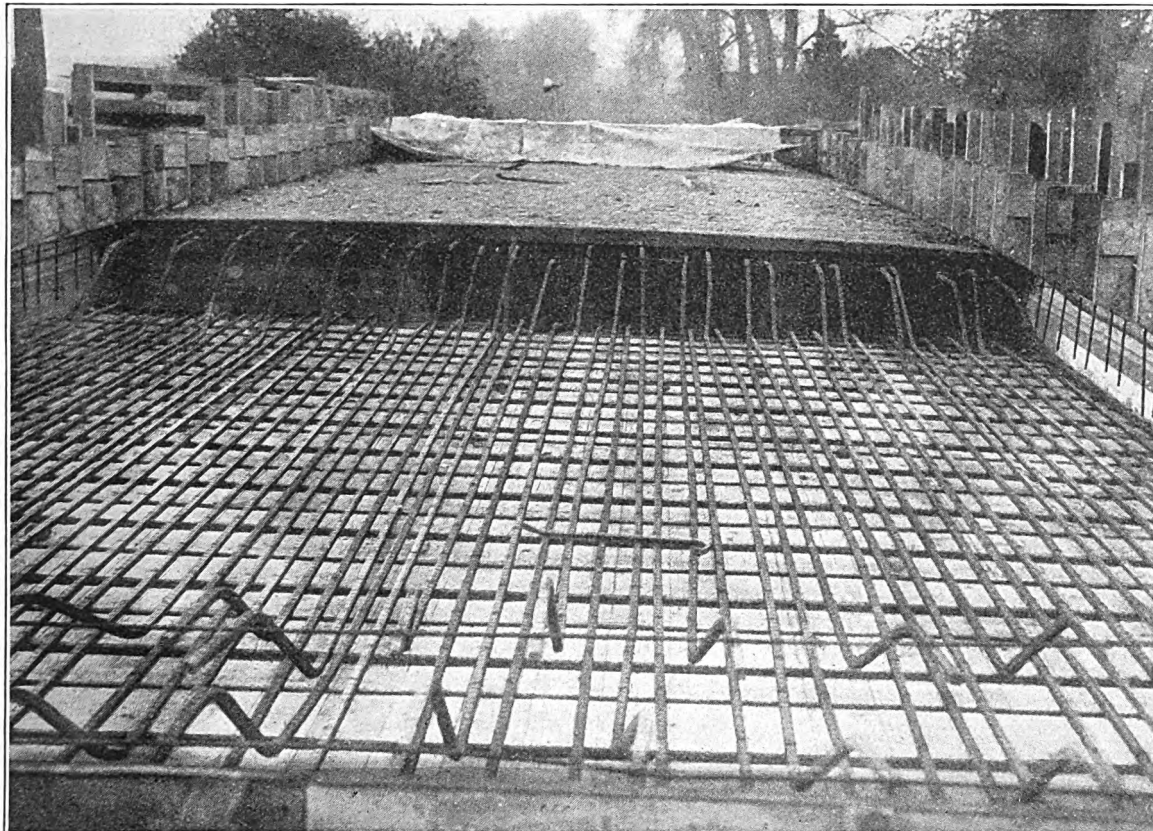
Method of Placing Reinforcing Bars In Floor of Overhead Highway Bridges.
